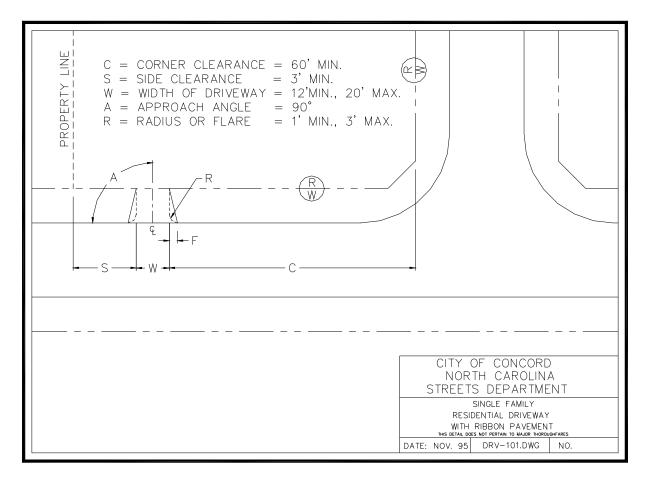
Single-Family Residential Driveway with Ribbon Pavement.
